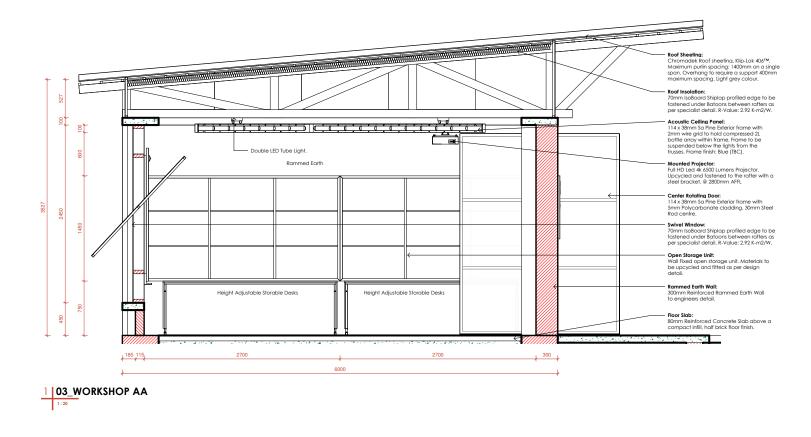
Workshop section 1: section detail interior, (Author, 2021)
